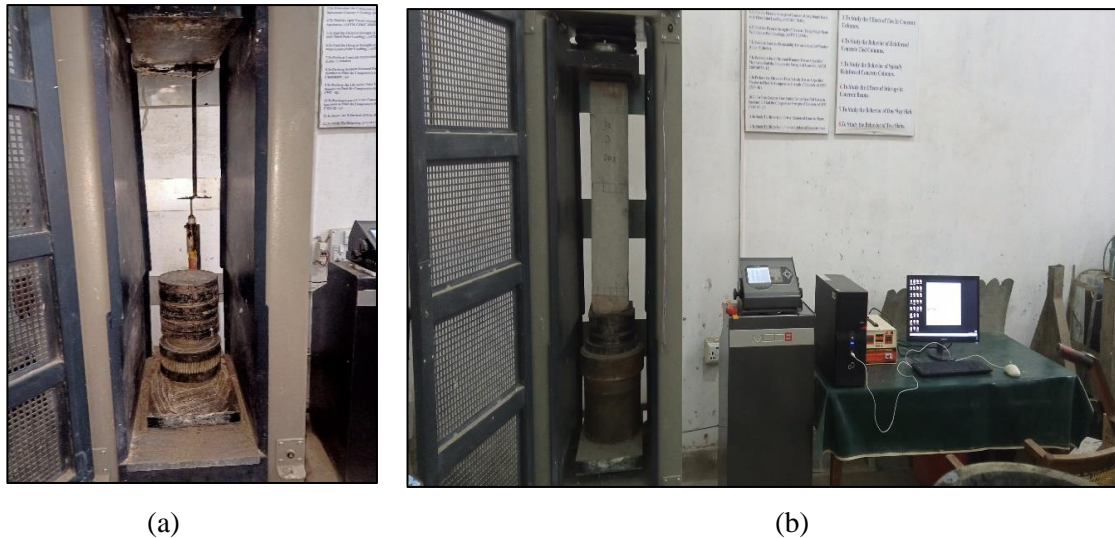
(a) Compression testing machine setup (b) Sample during testing in CTM
